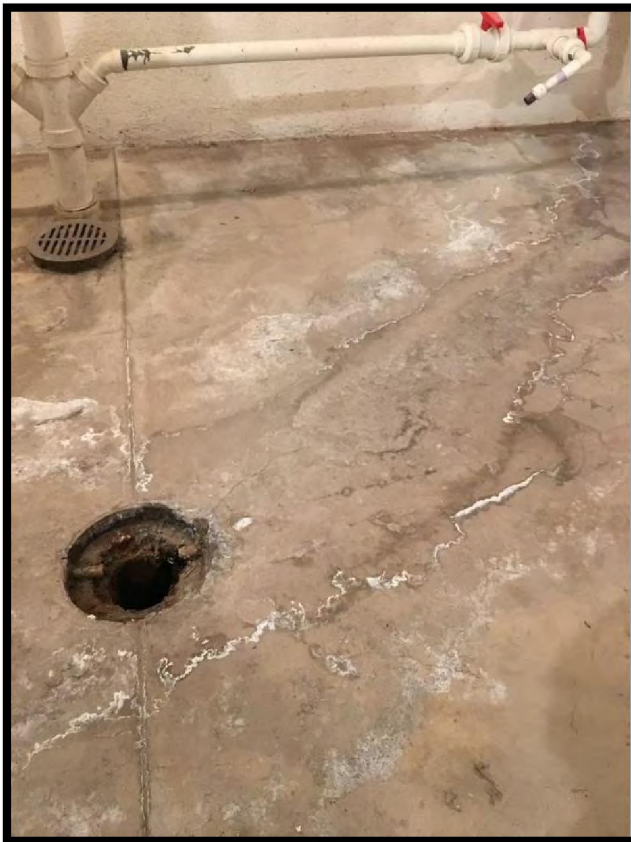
A&B, Aerobic Digester Concrete and Wall Cracks (Truck Sludge Loading)
